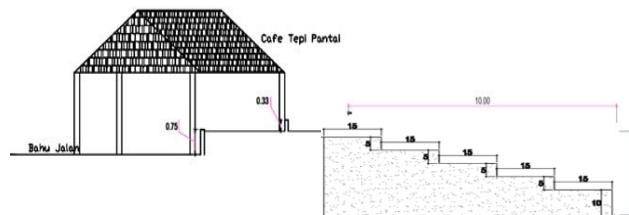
Slope of 1:5 recommended for seawall and embankment height of 0.5 m
